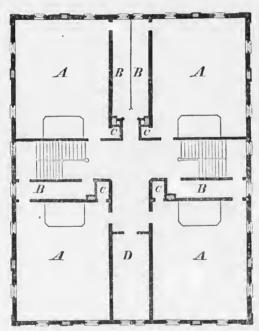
Basement Plan of a Central on High School, adapted to Fig. 178.
